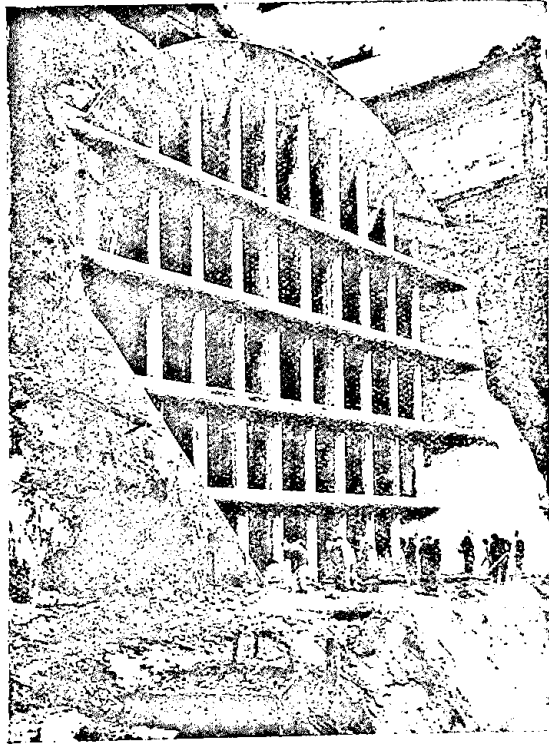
Underground sluice tunnel outlet — Genissiat Project
